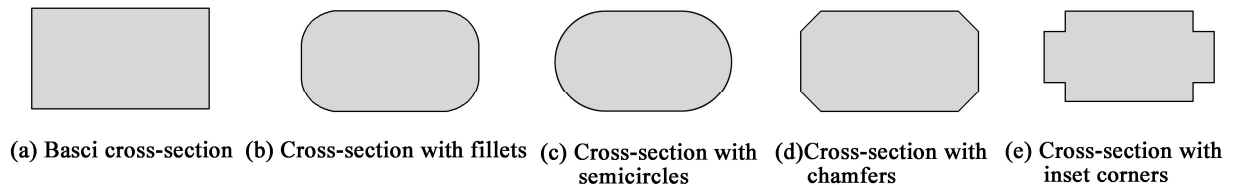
Optimization of the cross-sectional shape of the bridge tower
